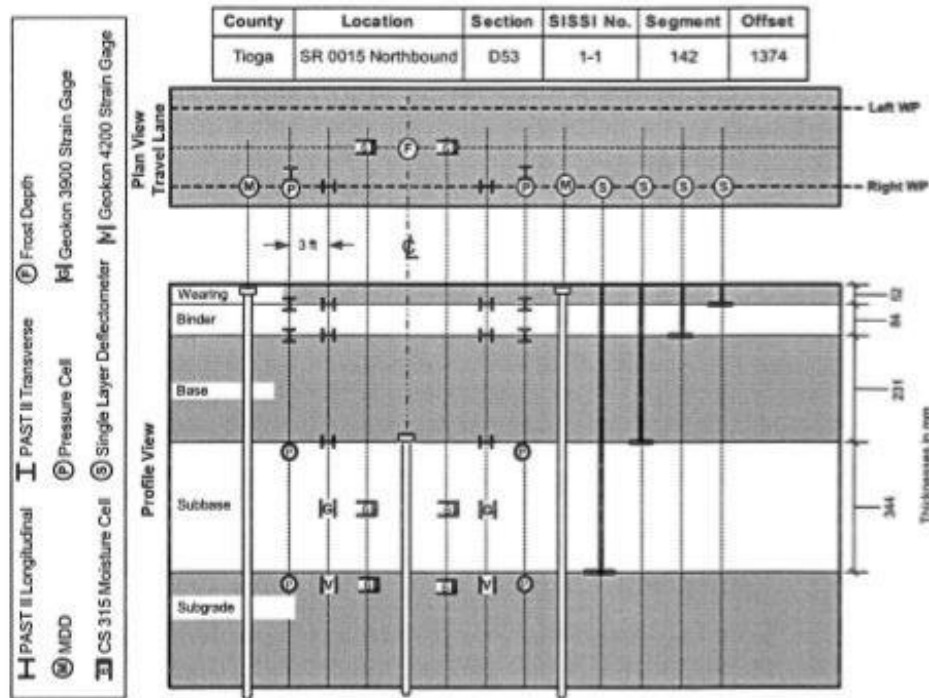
Layout of Gauges at SISSI site (Stoffels et al., 2006)
